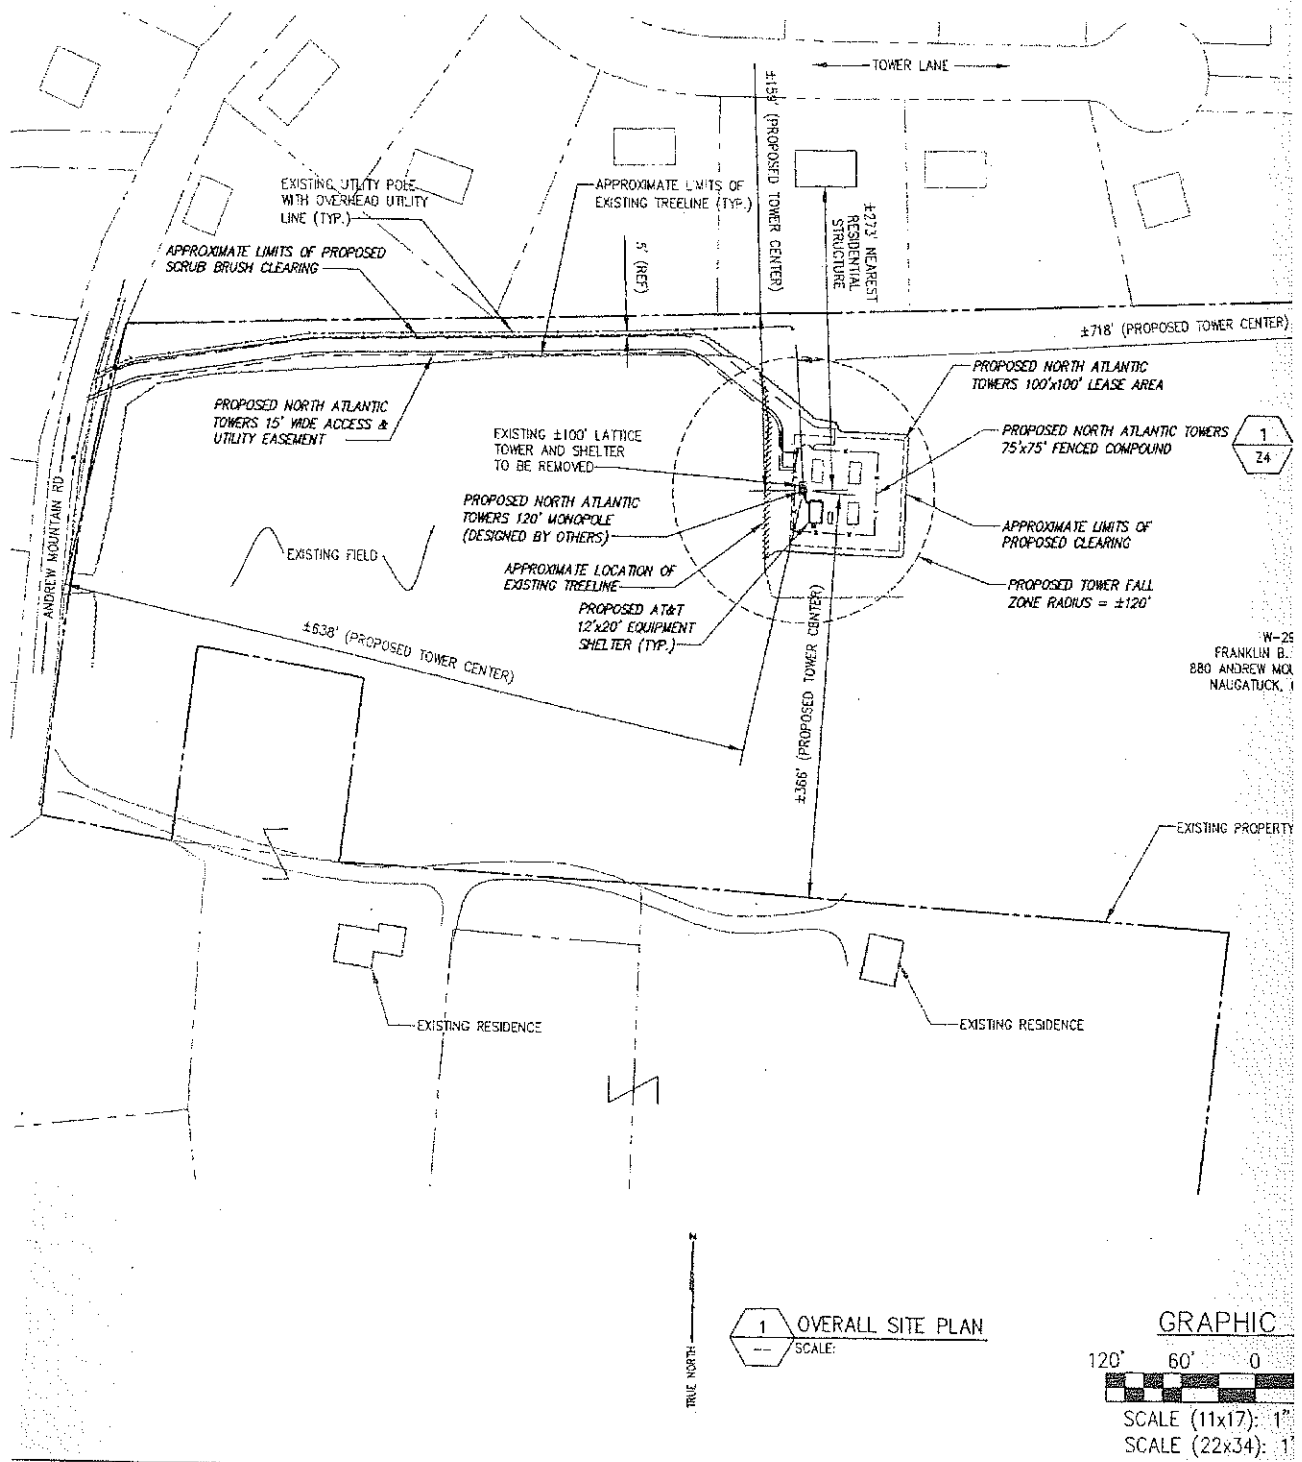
Site plan showing the access road in the relocated position approximately 15 feet from the northern property boundary. (NAT/AT&T 4)
